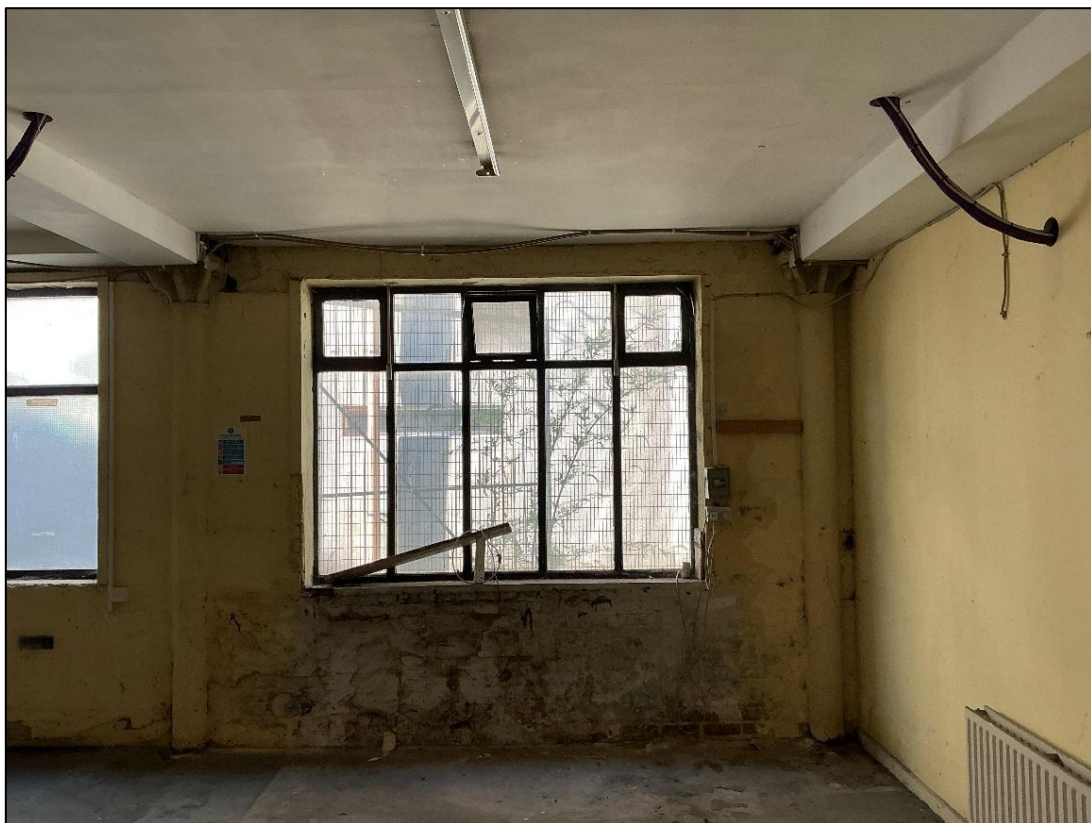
Existing Warehouse Building Deterioration of External Walls (northwest corner)
